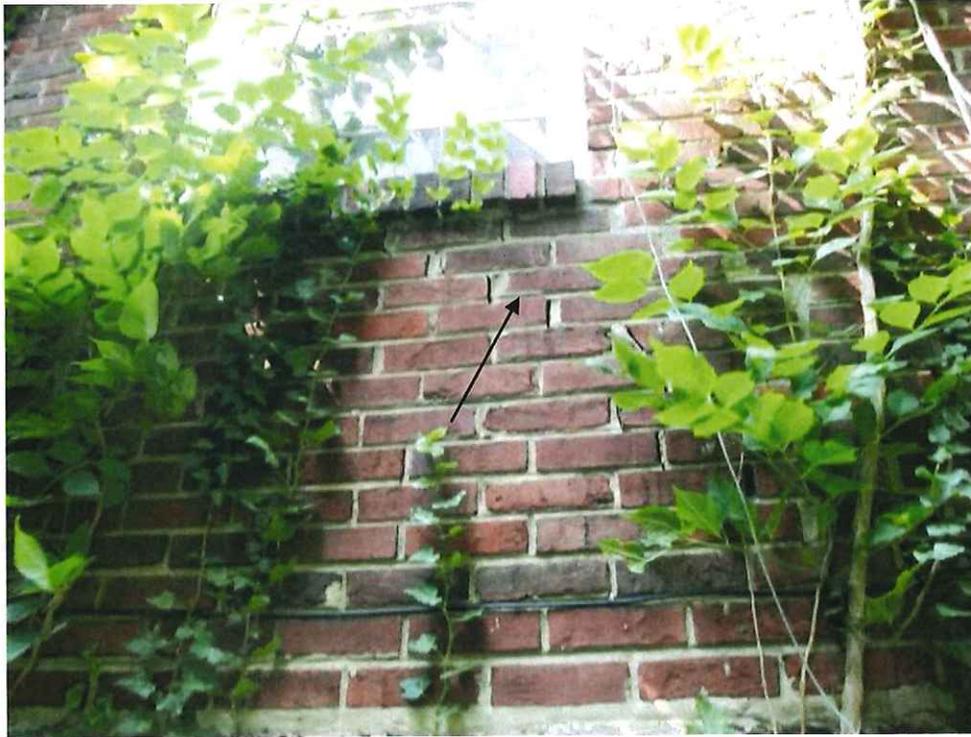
Cracking of brick veneer on the rear wall of the residence.
